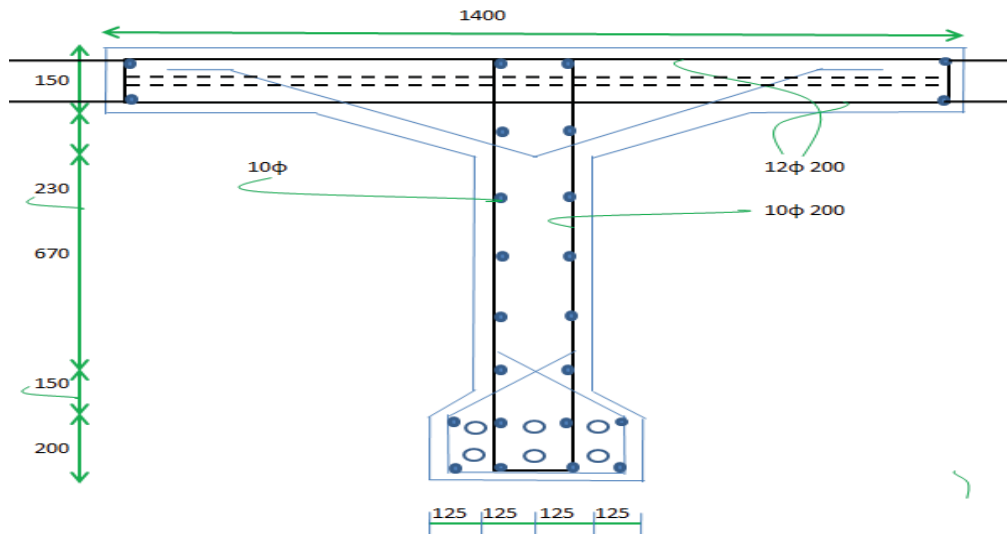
Cross section showing details of longitudinal girders. Dimensions in mm.
